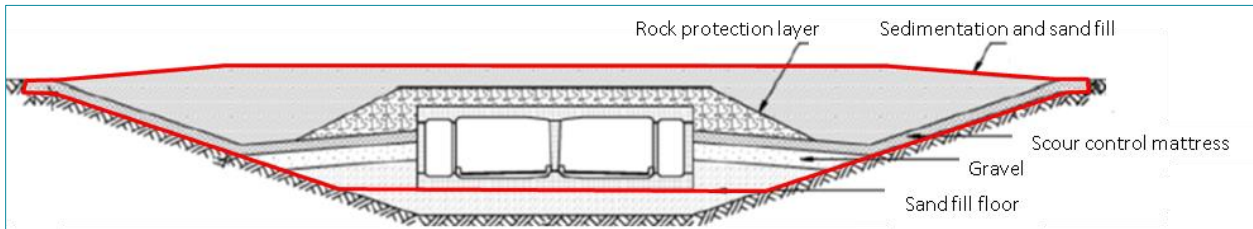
Cross-section of the Tunnel (not to Scale). Red Polygon Indicates Assumed Extent of Excavation.
